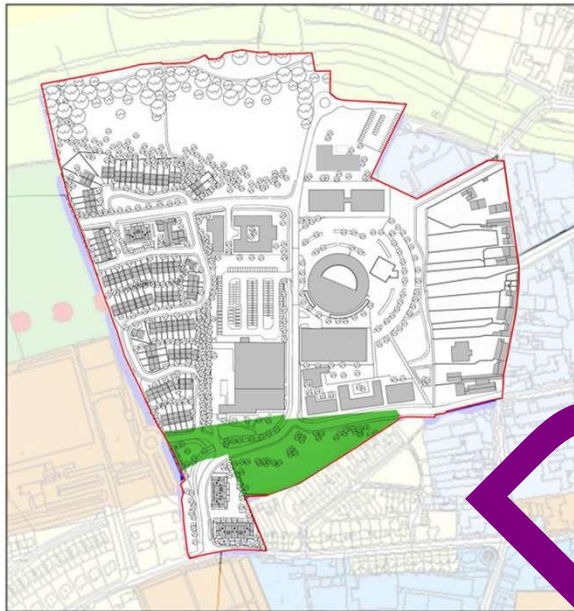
Indicative Master Plan Block Layout in accordance with F1 Open Space Land Use Zoning Objectives.
